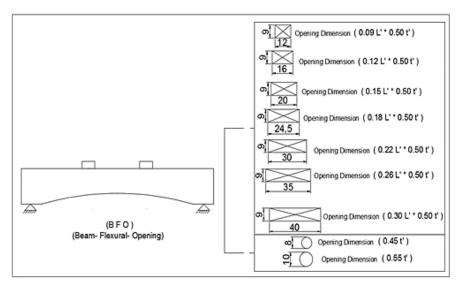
Shape and dimensions of the beam openings (all dimensions are cm).
